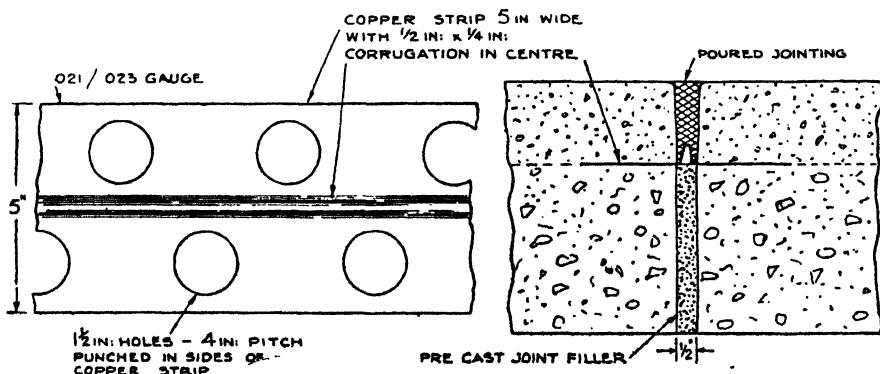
SECTIONAL VIEW OF COPPER STRIP JOINT
